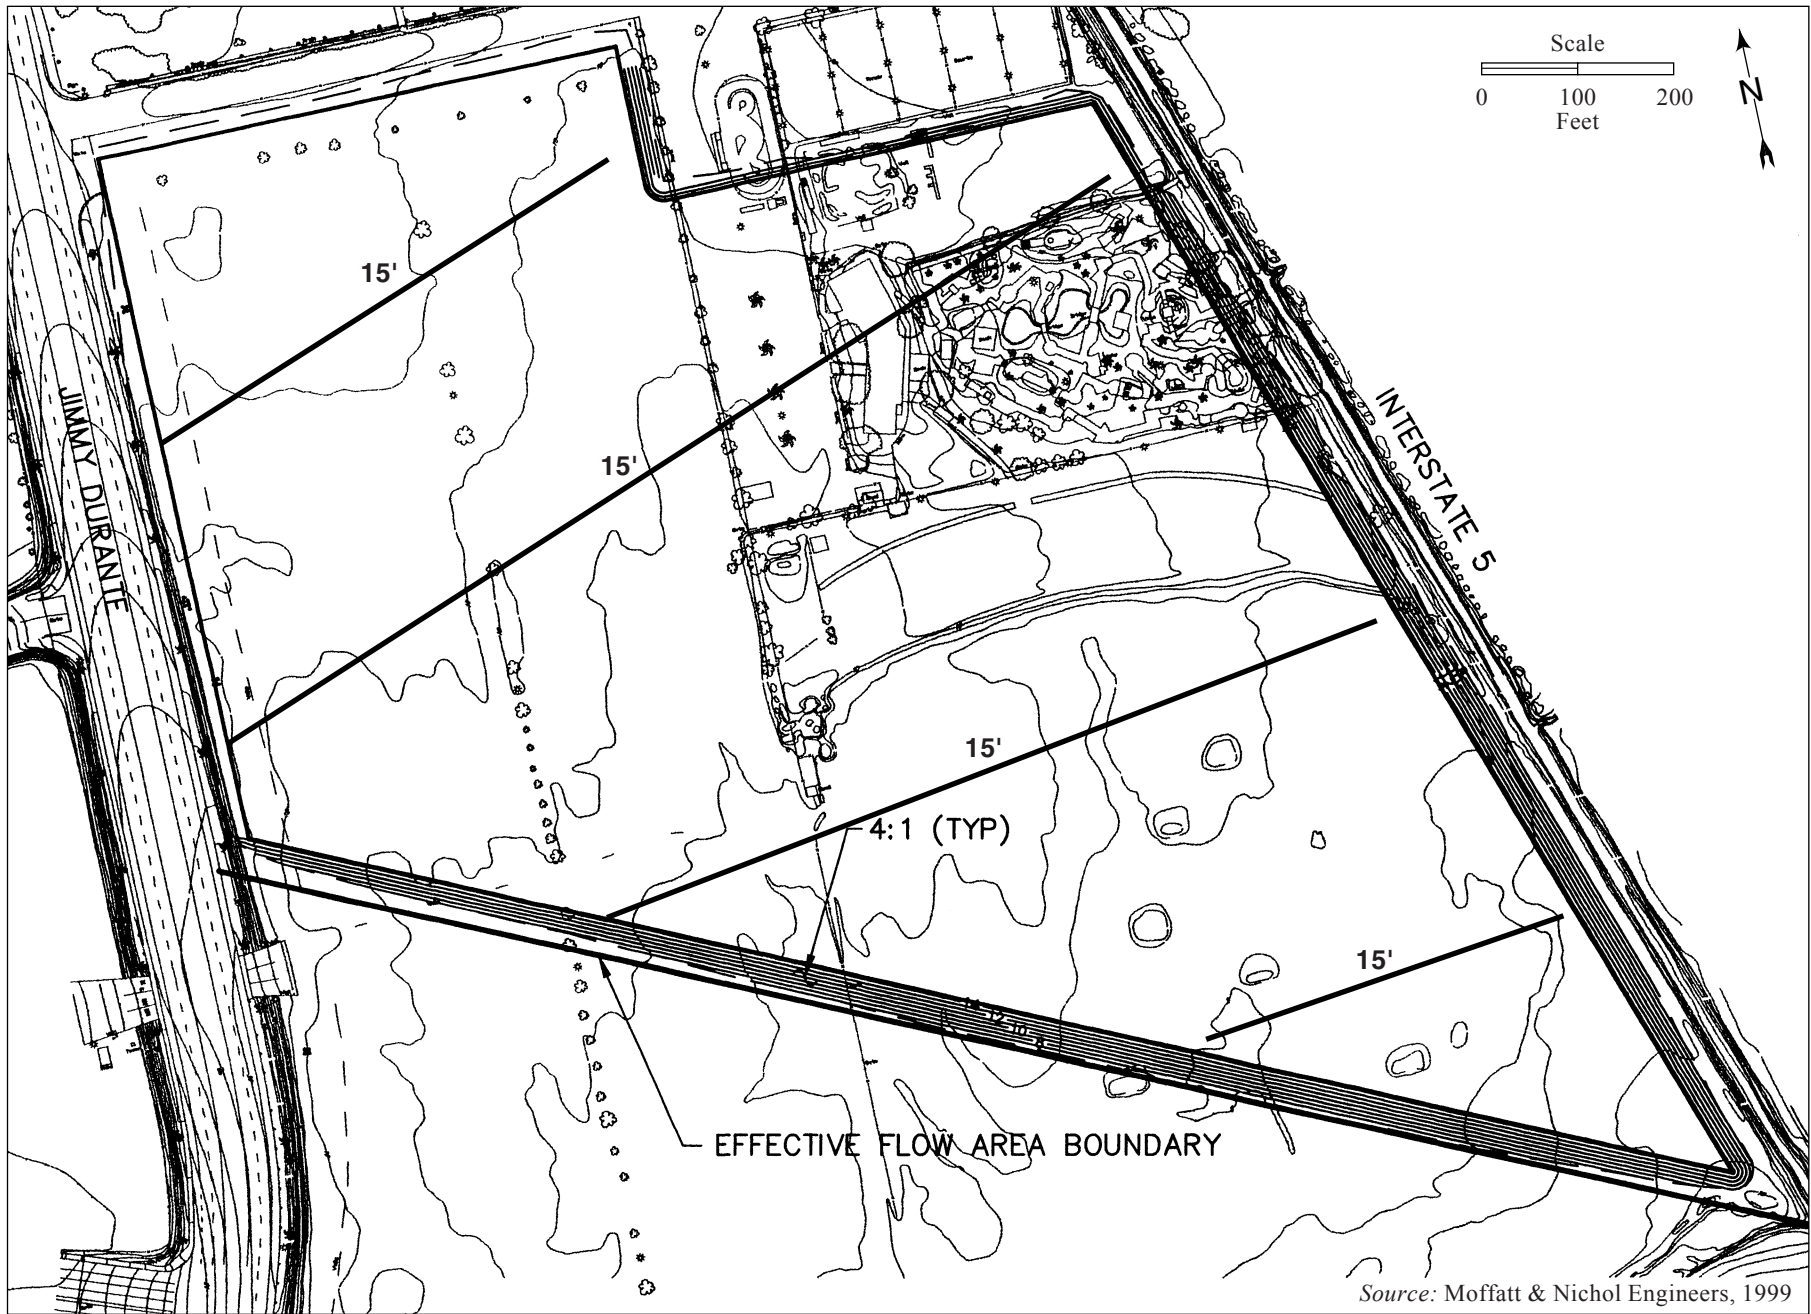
Disposal Site DS38 Grading Plan
